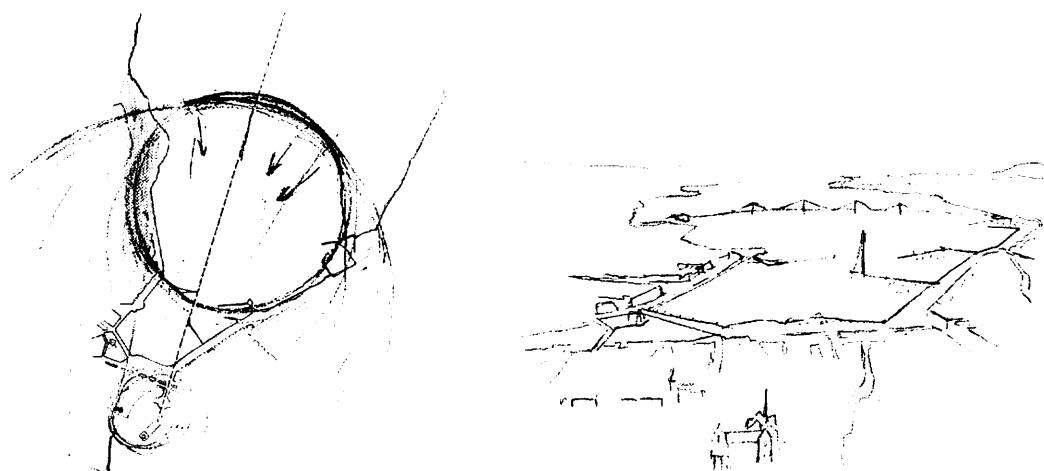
First sketches of the Geneva Lake crossing – Switzerland [3]
